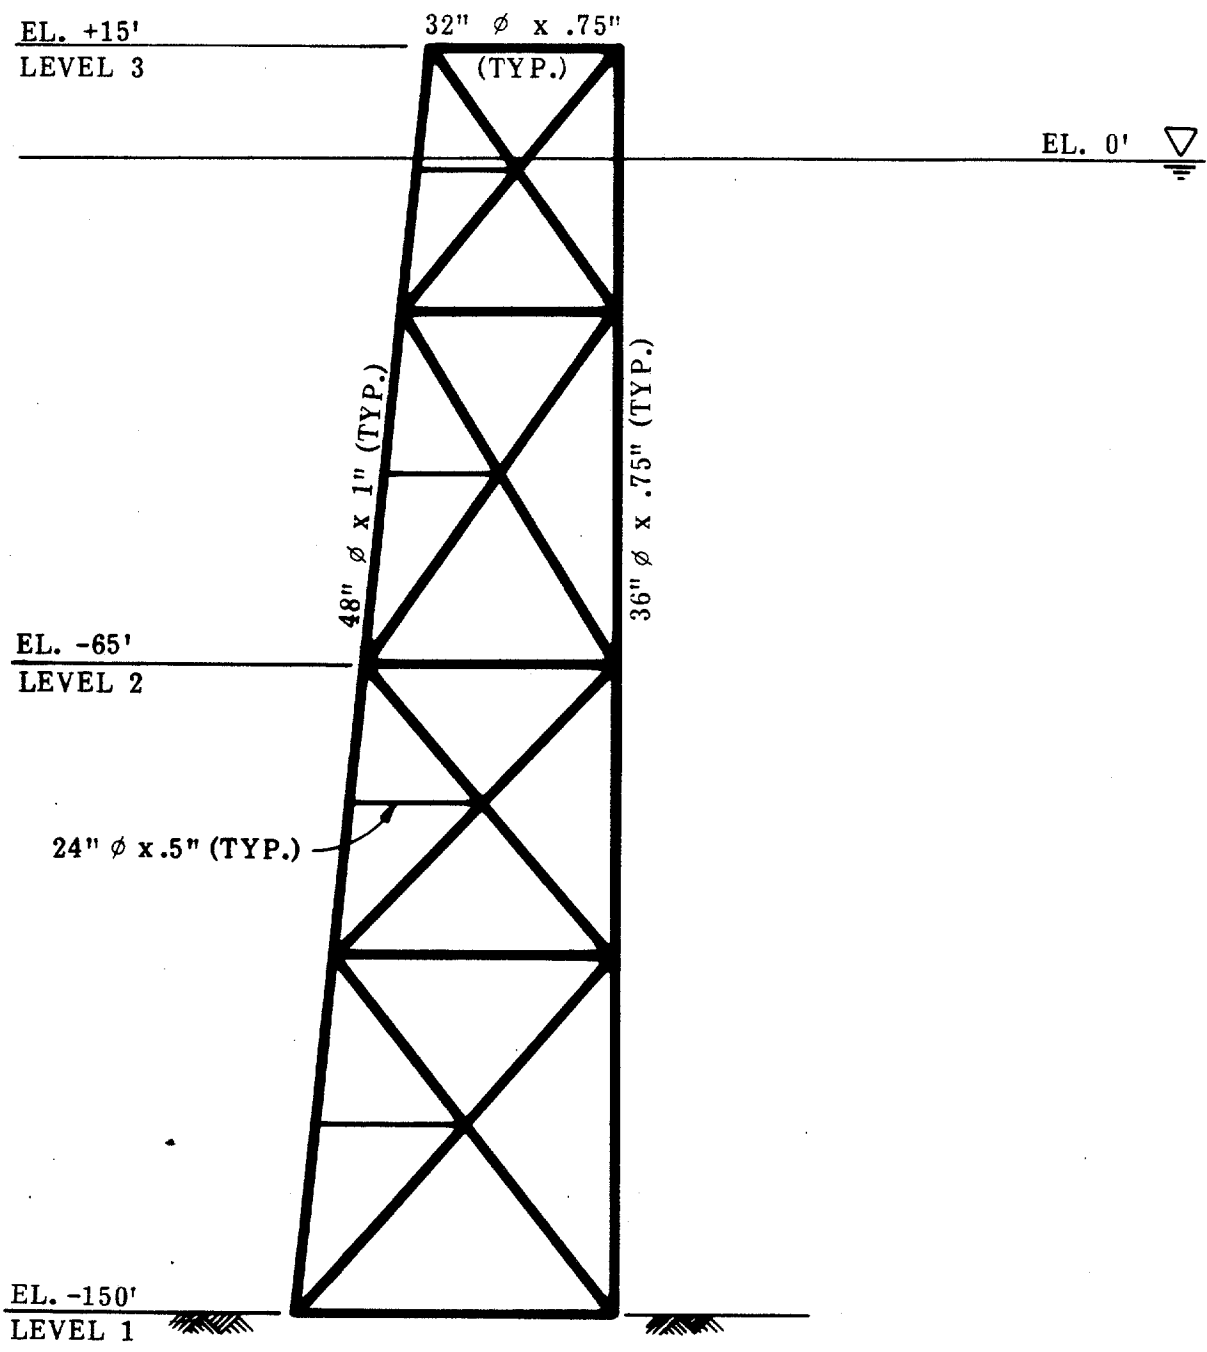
MULTIPLE JACKET CASE, 150 FT WATER DEPTH, LAUNCH TRUSS
